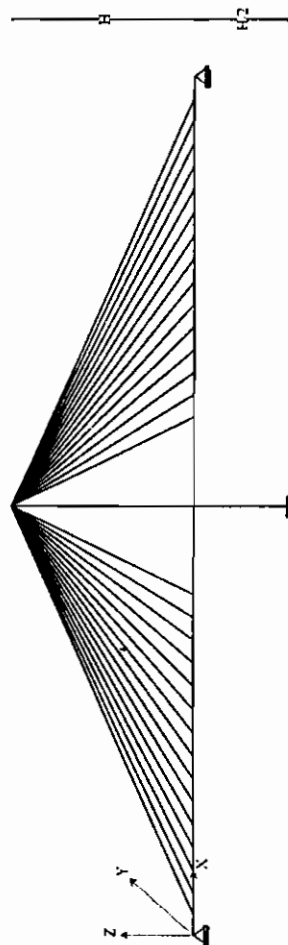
b): Cable stayed bridge with single plane of cables (radiating shape).
